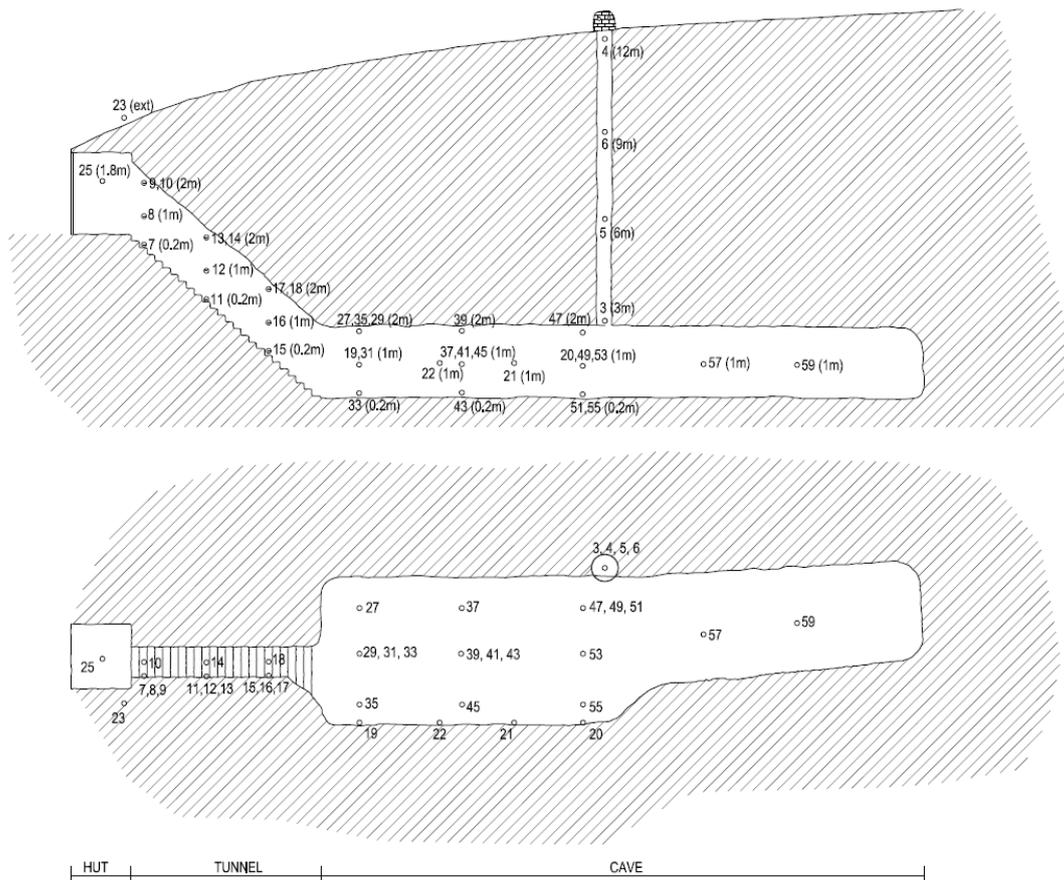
Elevation and layout of the underground construction. Position and height of the sensors.
